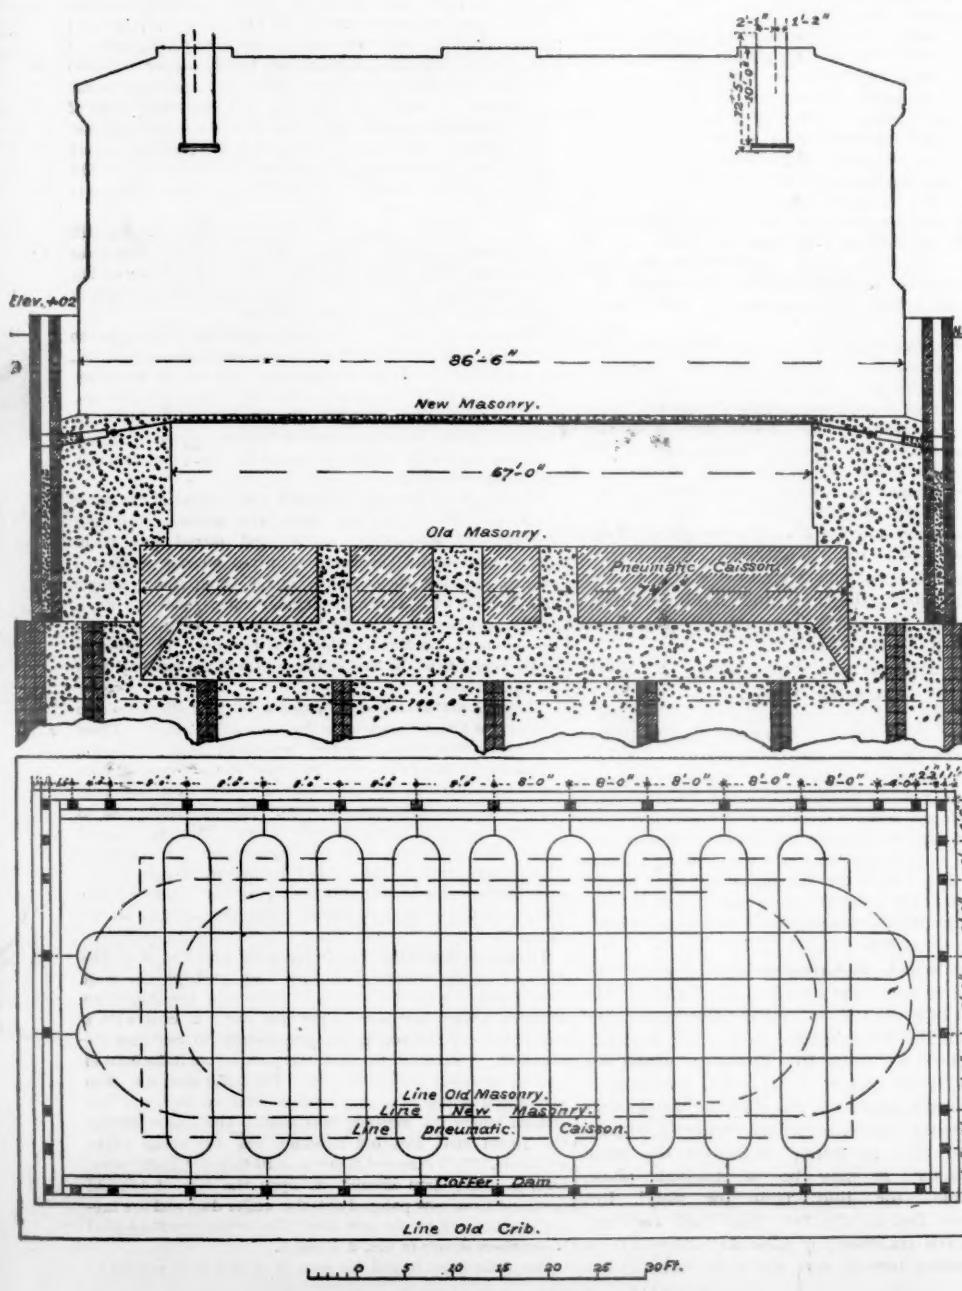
Pier No. 2, Plan and Longitudinal Section.
